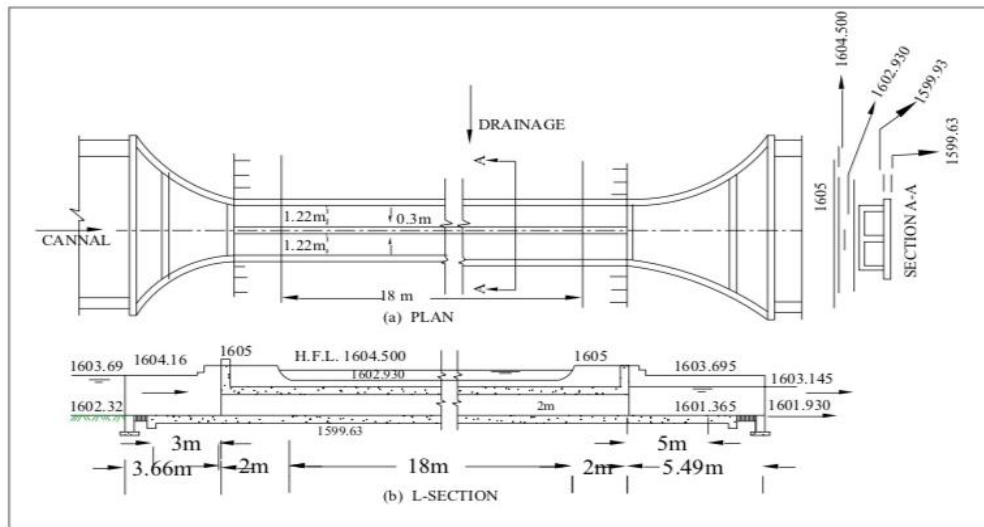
Plan and L-section of canal siphon at RD-17664 m
